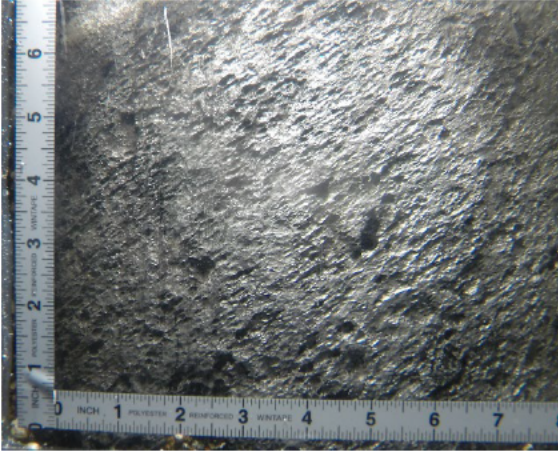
Typical underwater Level II, marine growth and corrosion scale removal, note heavy corrosion and pitting.
